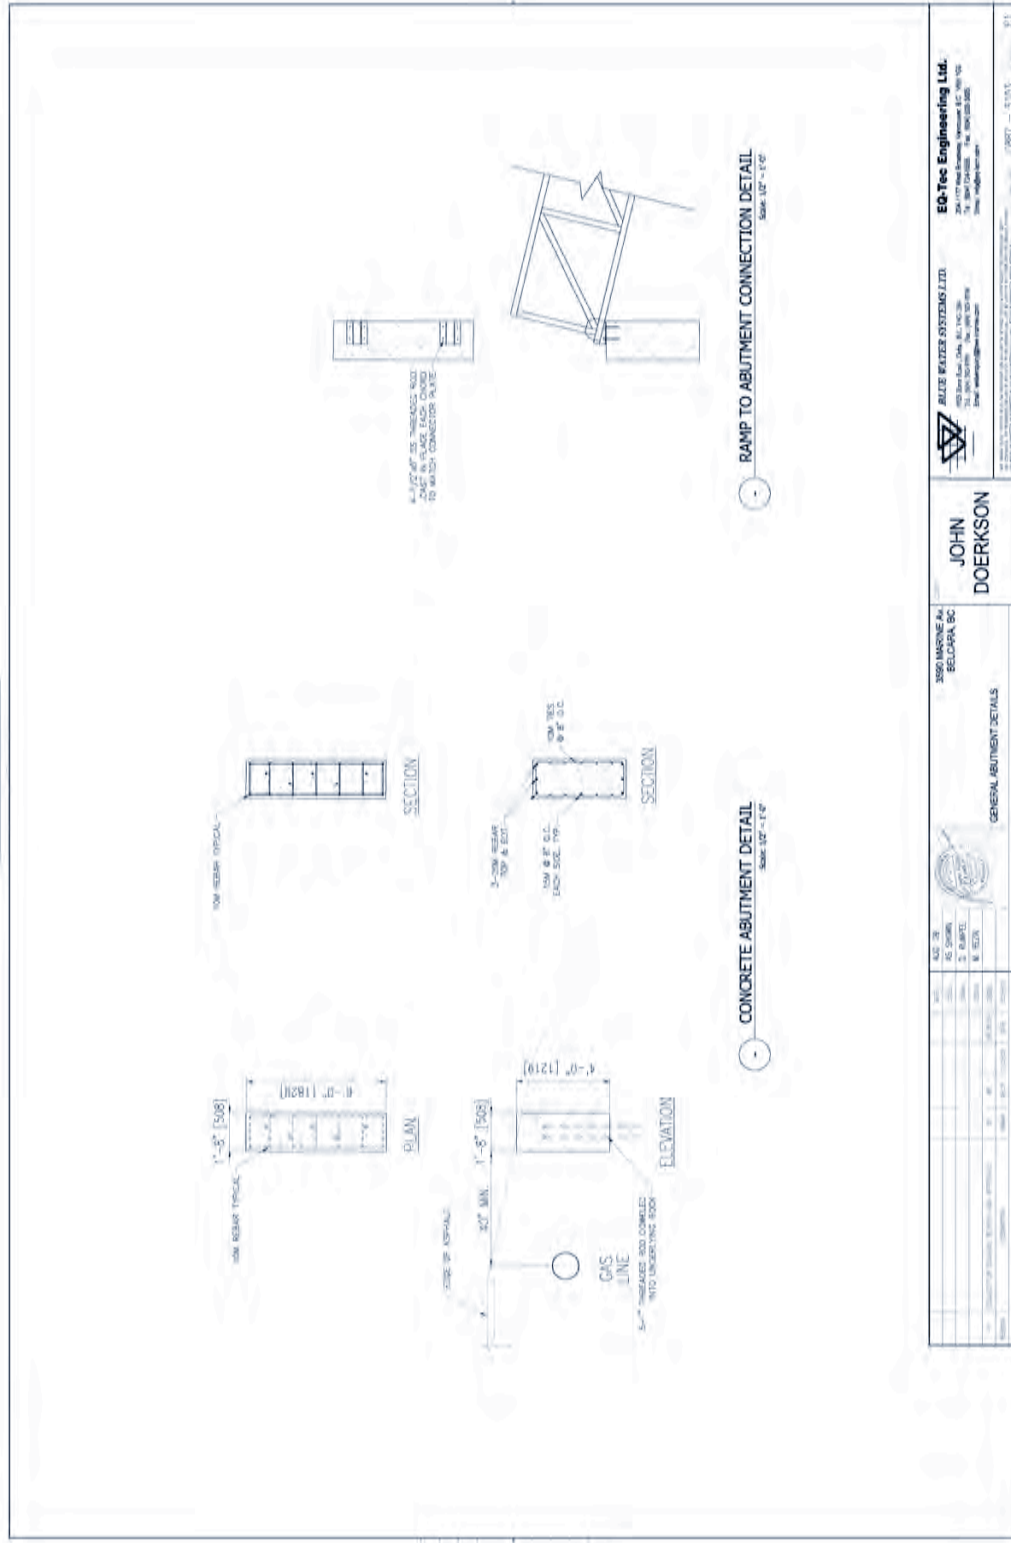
Landside abutment plans for the original proposed dock at 3707 Dollarton Highway, North Vancouver as assessed under SAP 2012-0061.
